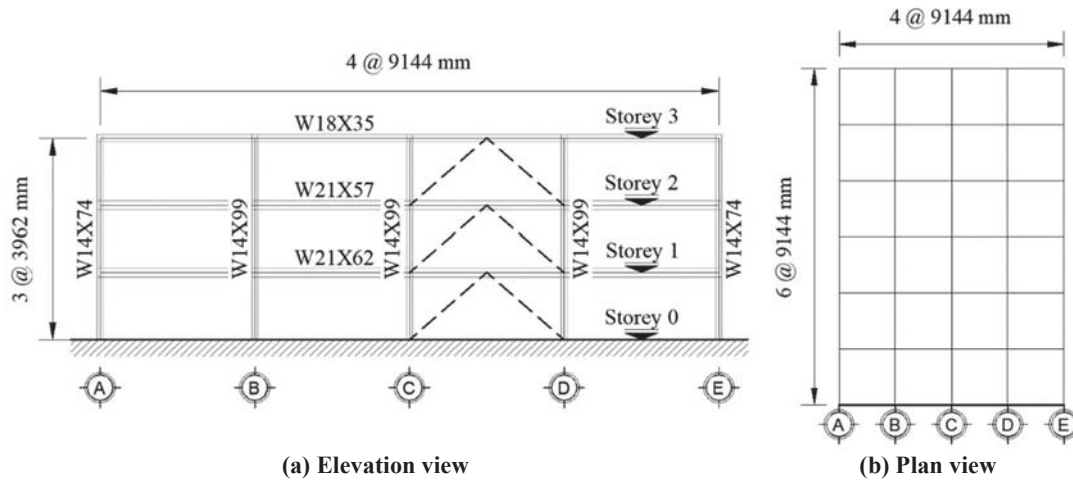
Description of the case-study structure: (a) elevation view of the MRF and location of braces in the retrofitting schemes; (b) plan view of the typical storey floor.
